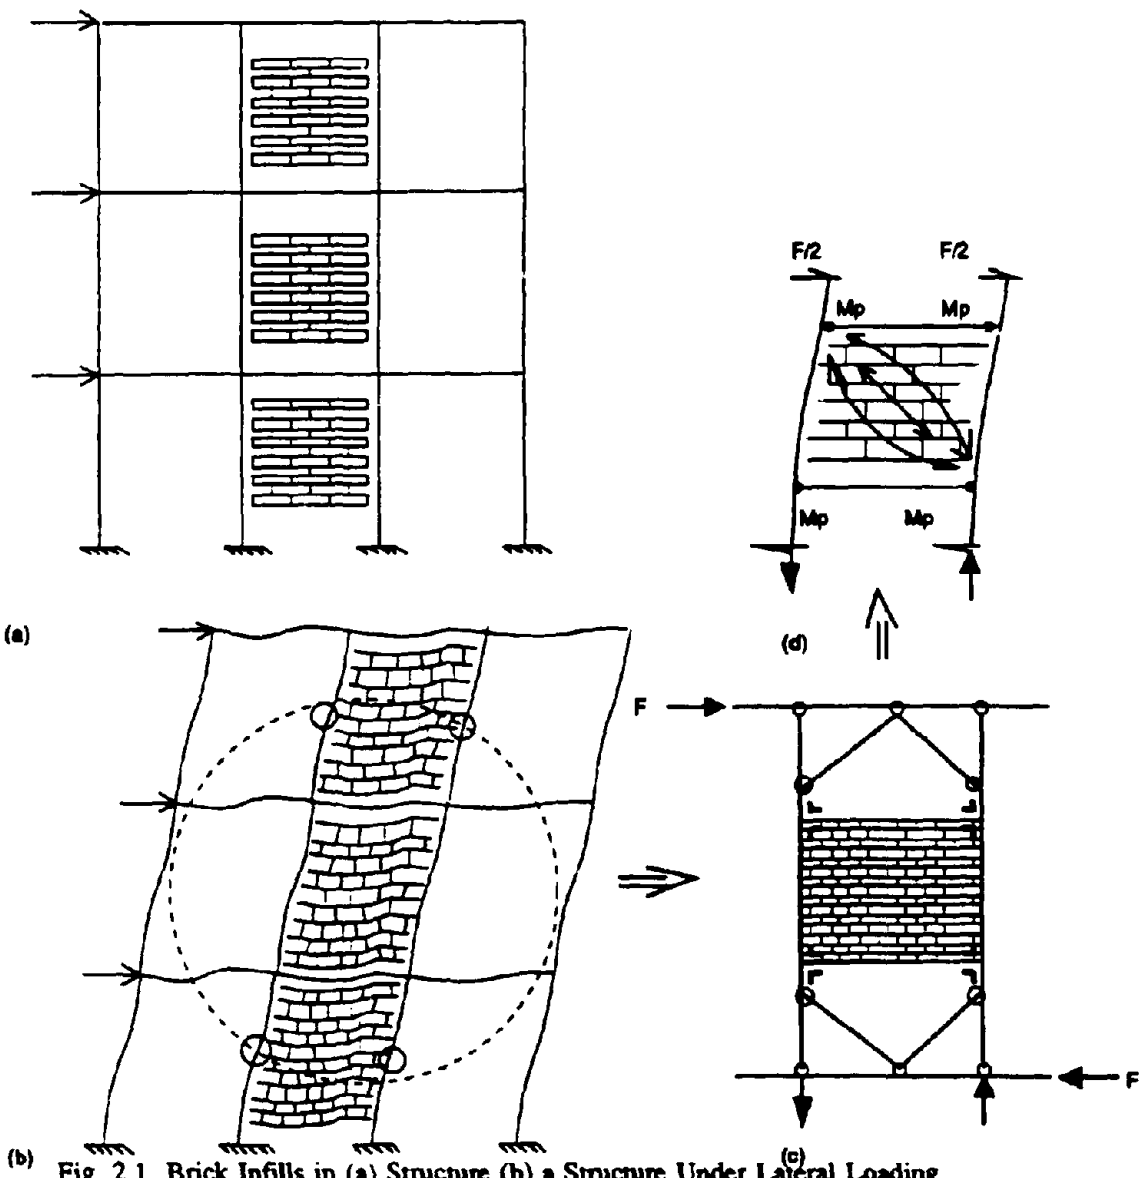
Brick Infills in (a) Structure (b) a Structure Under Lateral Loading (c) Experimental Subassemblage (d) Boundary Conditions of Subassemblage
